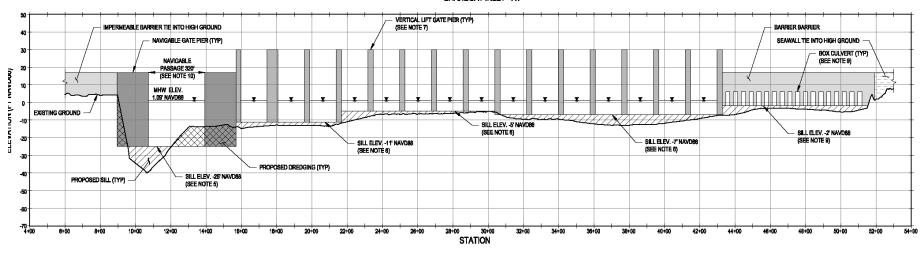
Barnegat Inlet SSB A-1 Alignment Cross Section
